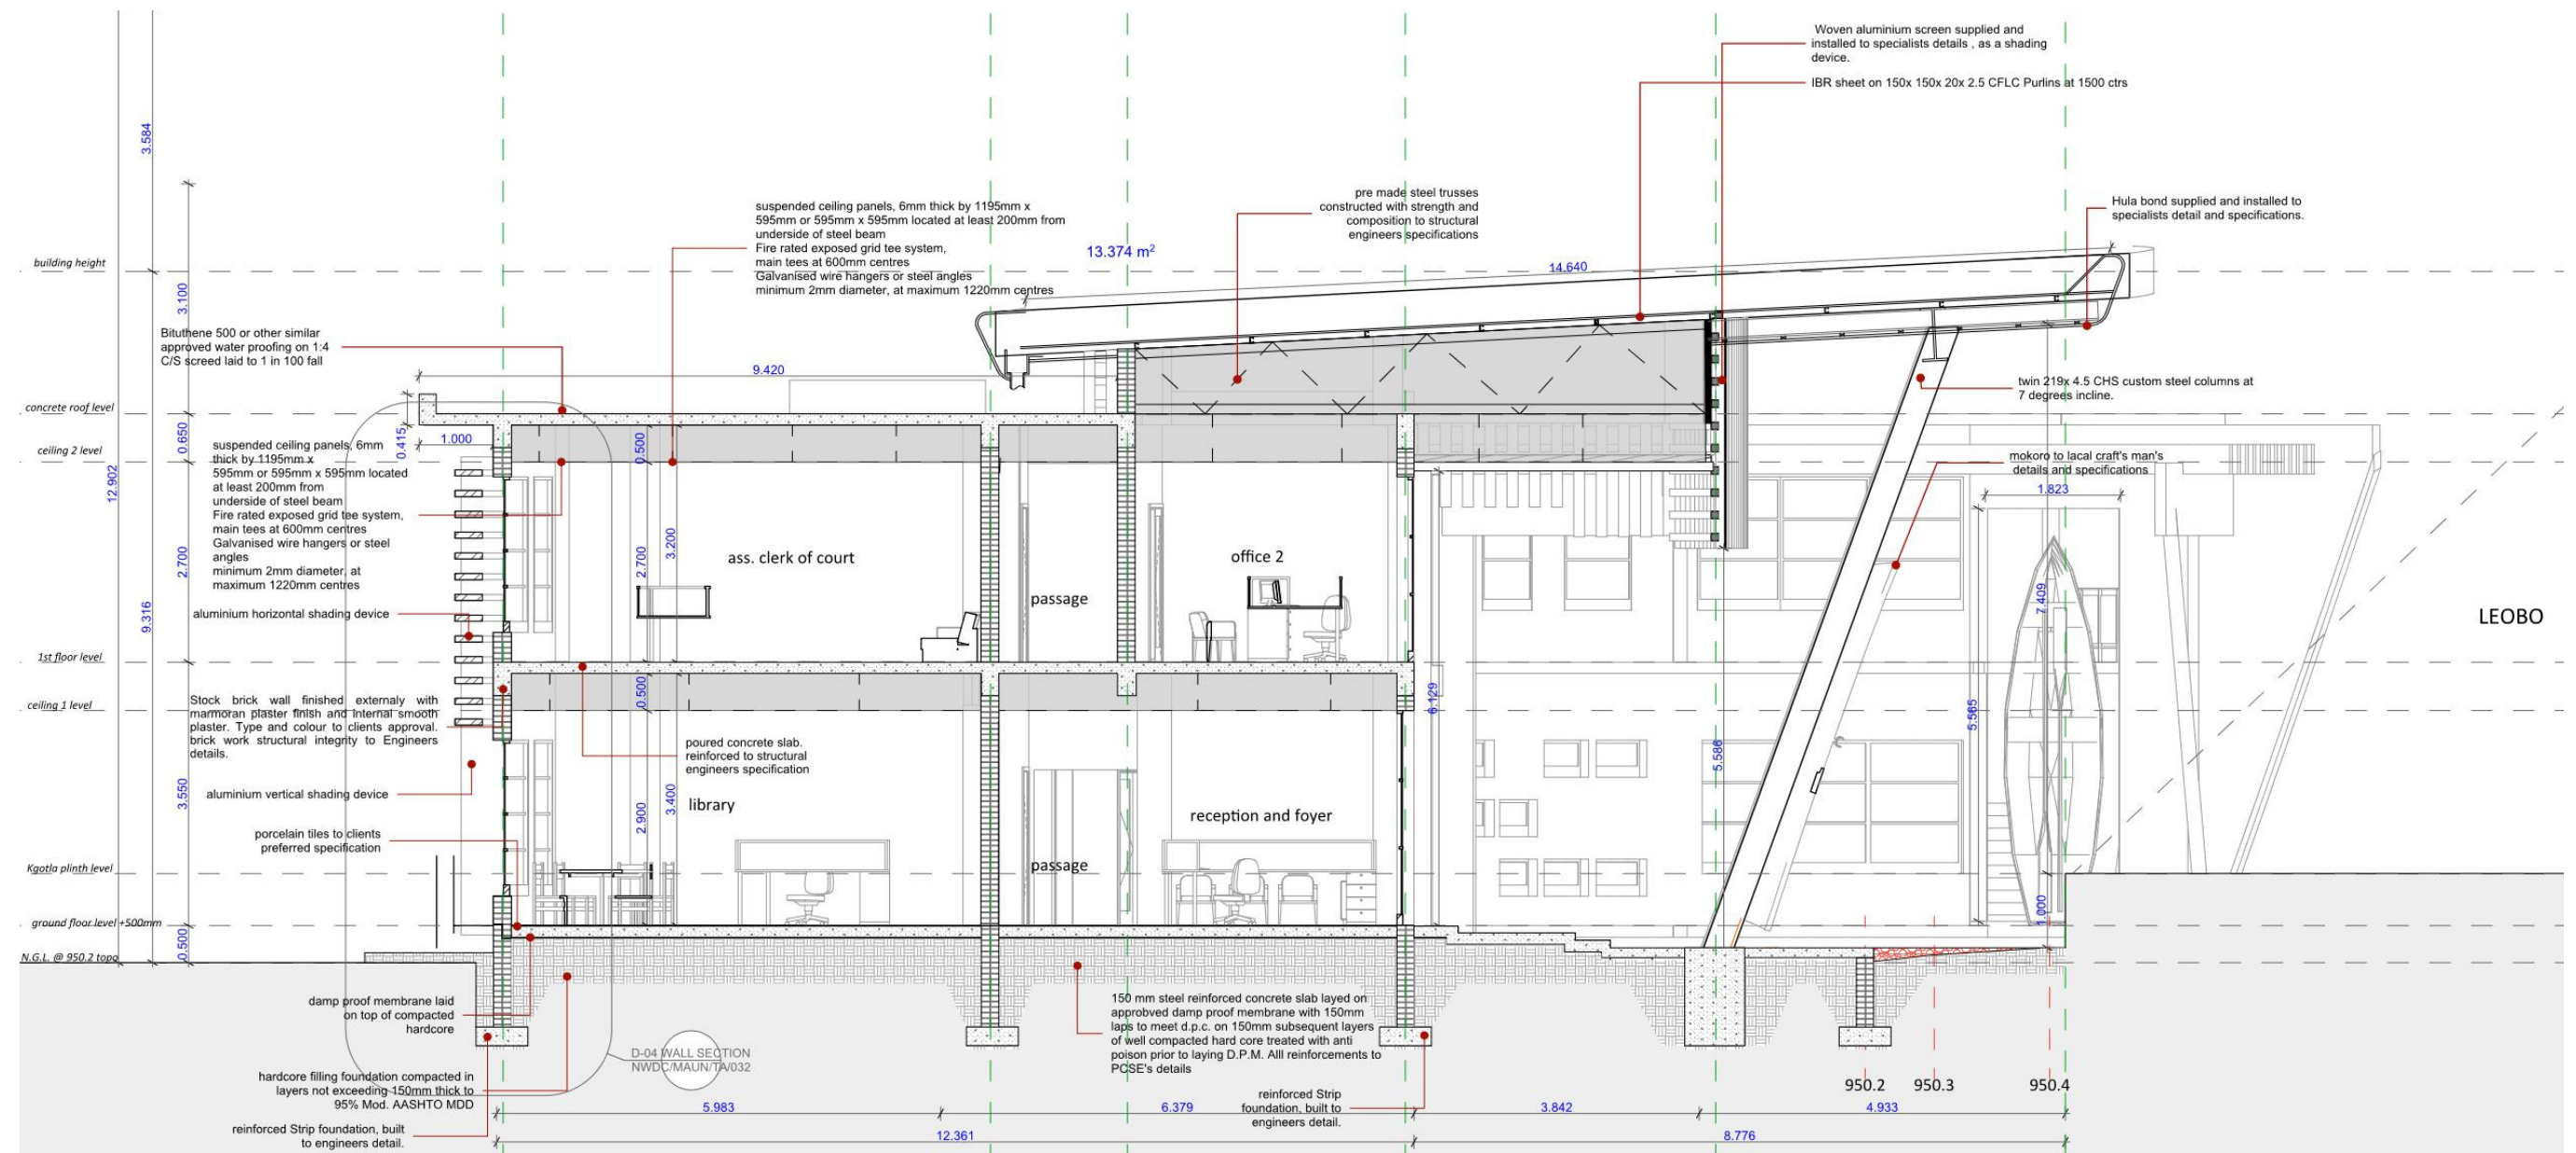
Section 01 - Cross section through the proposed tribal admin office building
